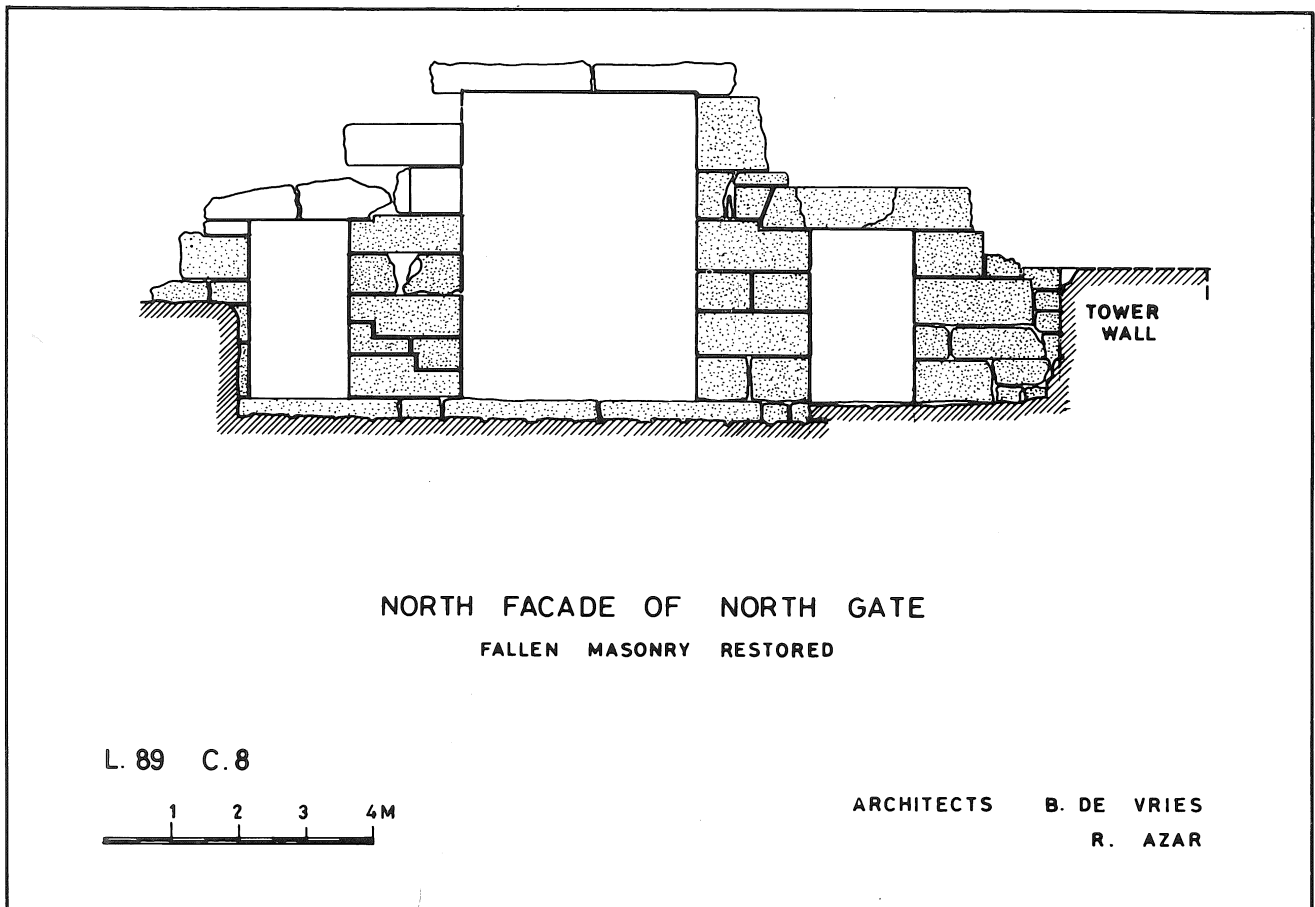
Elevation of the north (exterior) facade of the northern gateway, with some fallen masonry restored.
